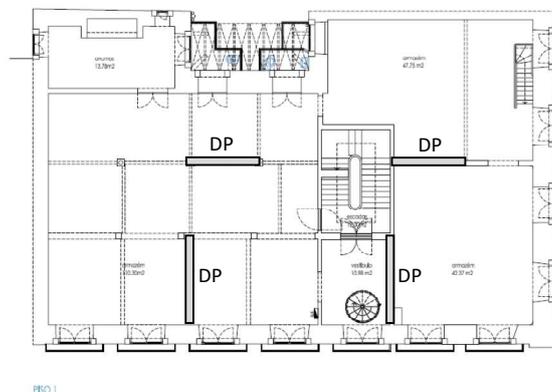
Plan of floor 1. Possible locations of the Dissipation Panels (DP).
